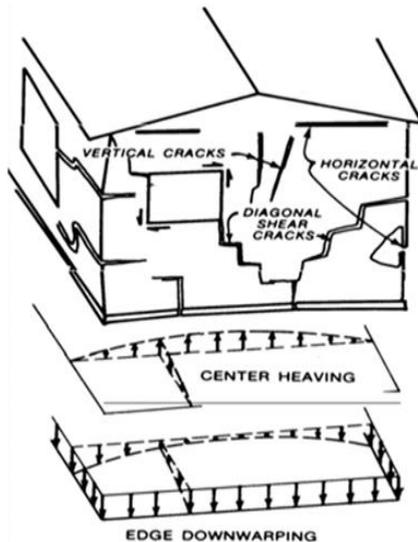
Cracks patterns on exterior wall resulting from dome heave of foundation soil, [16]
